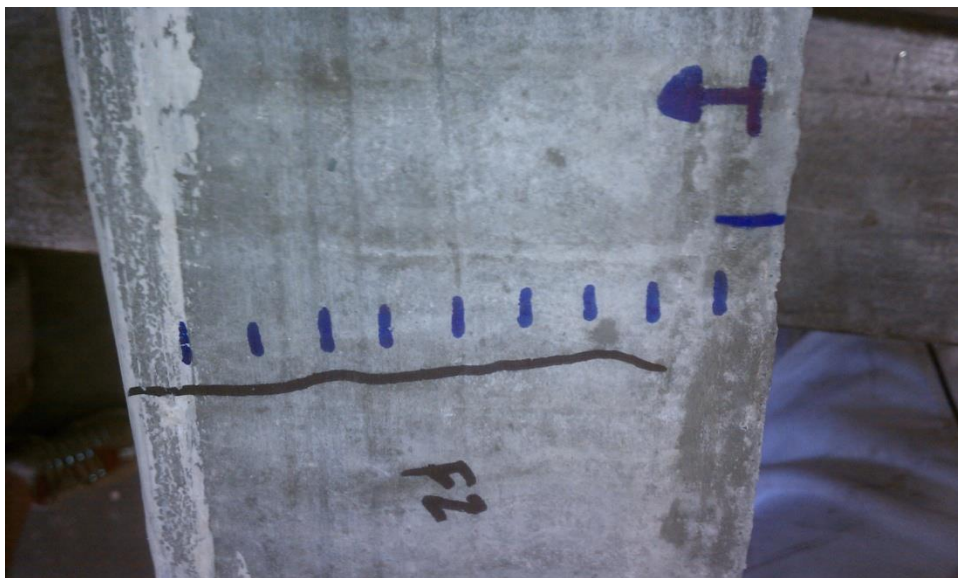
Crack width measurement marks every 1/2 in. on flexure specimen
